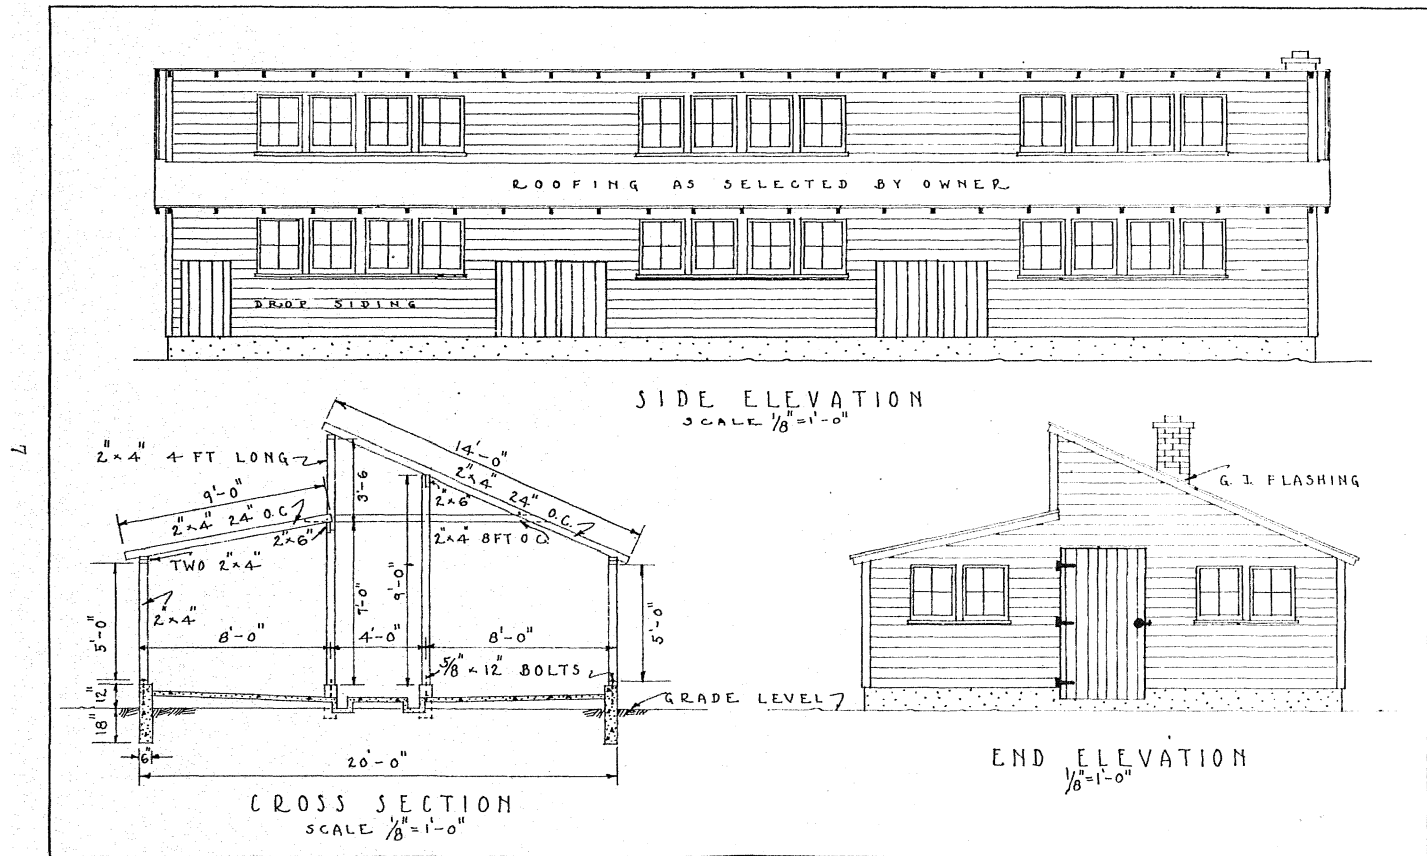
A half-monitor house to run east and west. No windows need be placed in north wall. To make a complete set of drawings add Figs. 2, 12, and 13.
